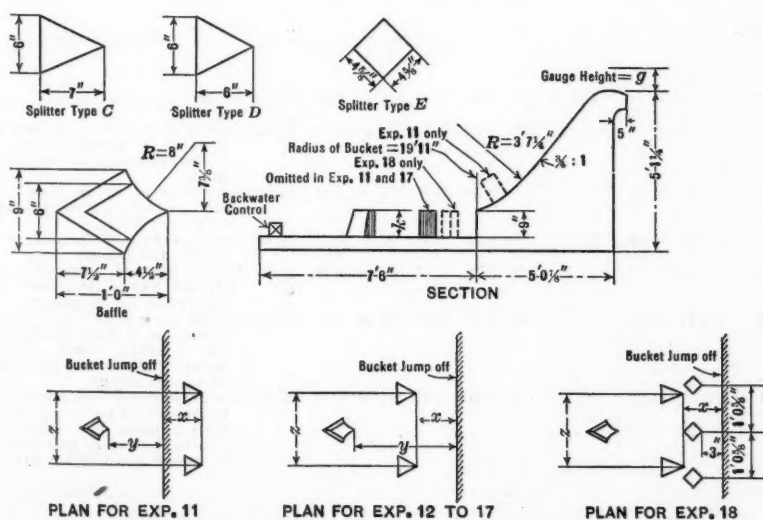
DETAILS OF MODELS USING CURVED BAFFLE-PIERS, PIT No. 3 DAM.
